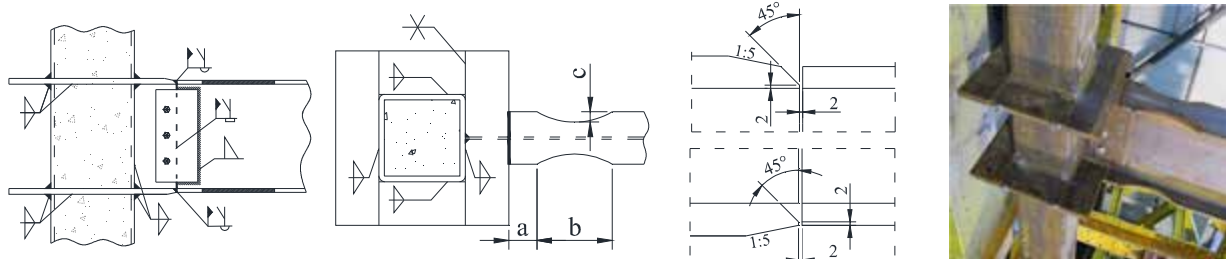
Welded RBS joint: configuration & preparation details for full penetration welds
